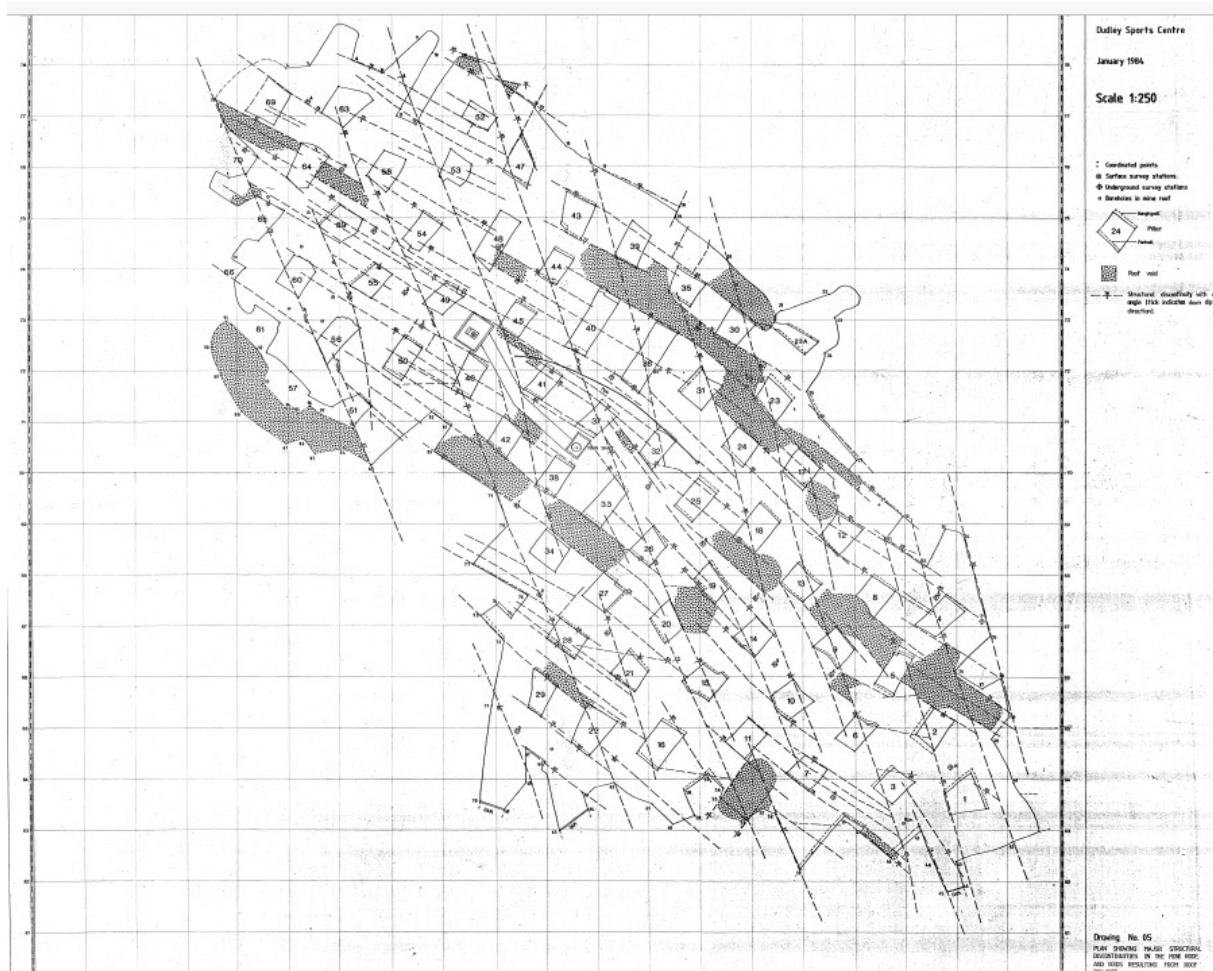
Plan of the Castlefield Mine with the pillars, structural discontinuities and the location of roof voids (shaded areas) from Hallam & Mitchell, 1984.
